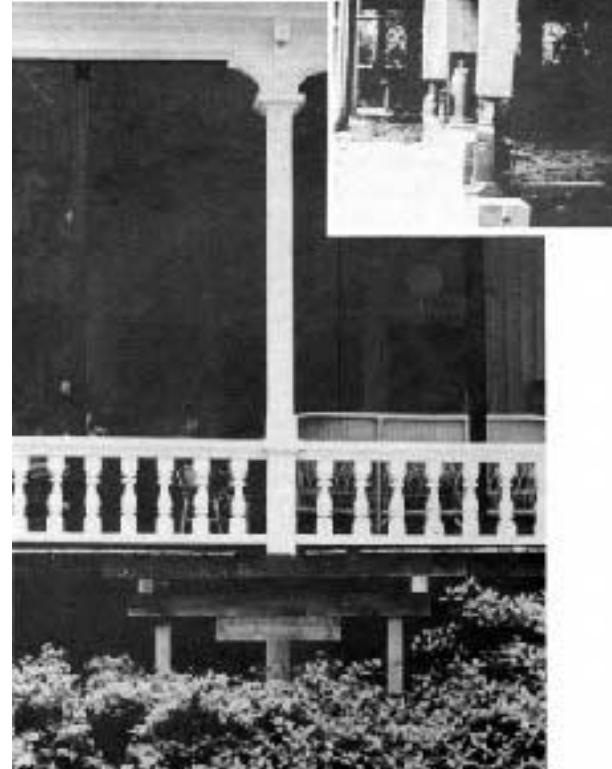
Jacks support the floor joists while a beam is being repaired. Make sure the jacks sit on a solid base (inset).
